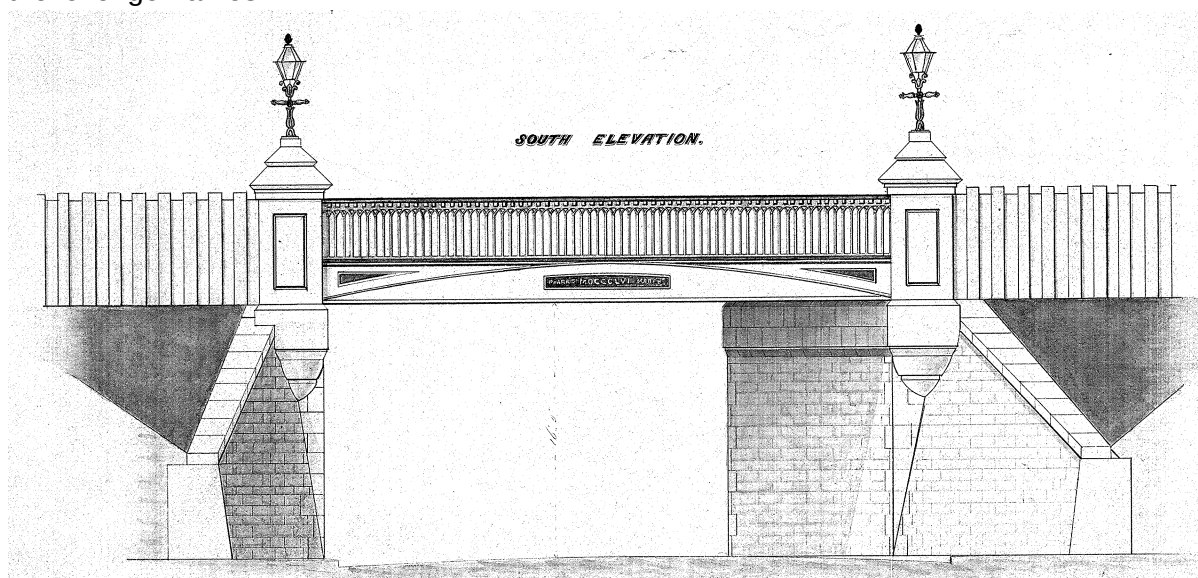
Undated plan from Network Rail of the south elevation (Network Rail 998371 LNE)
